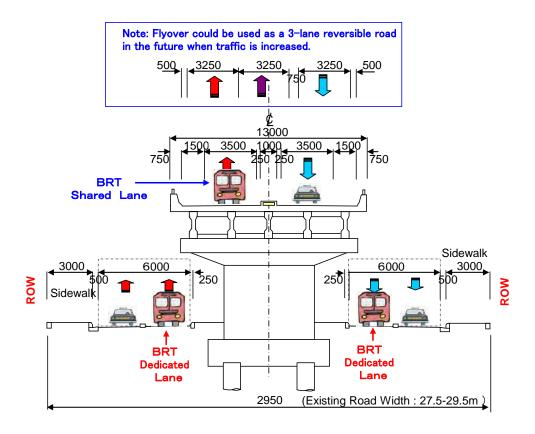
Typical Section of Flyover and Arterial Roads
